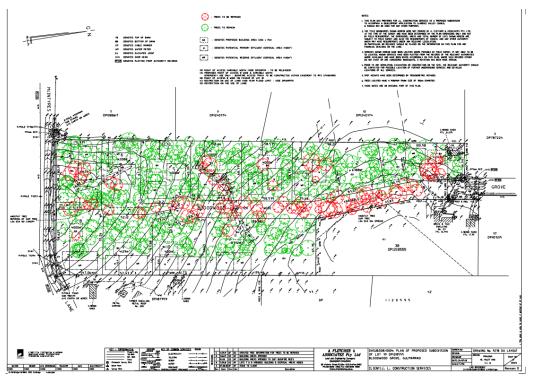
Subdivision plan showing trees to be removed (red) and retained (green)
